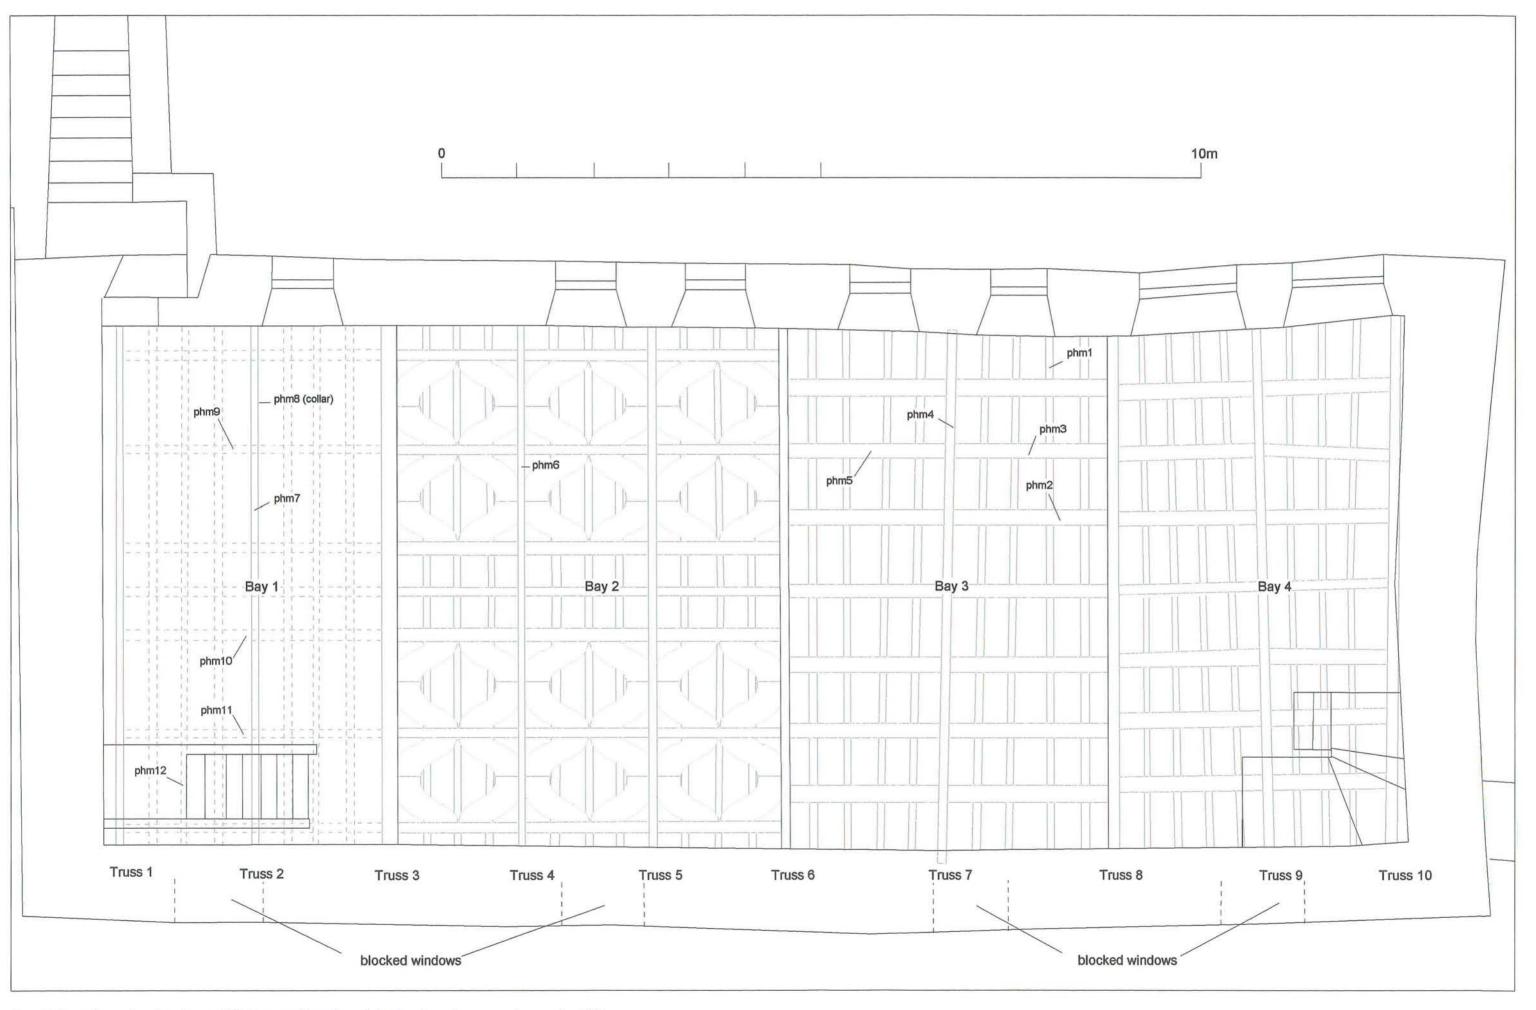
First Floor plan showing roof timbers and location of dendrochronology samples, scale 1:50
